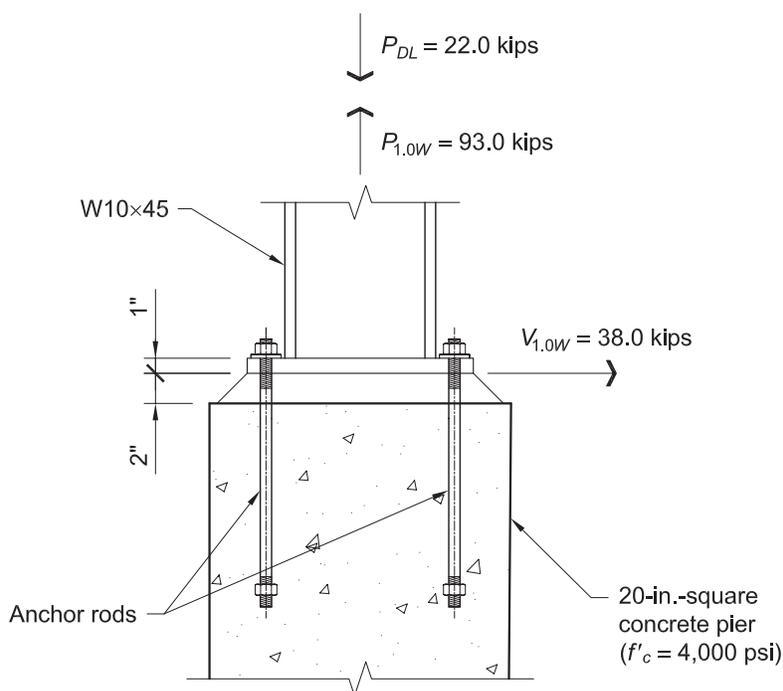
Applied loading and base connection configuration used in Example 4.7-6.
